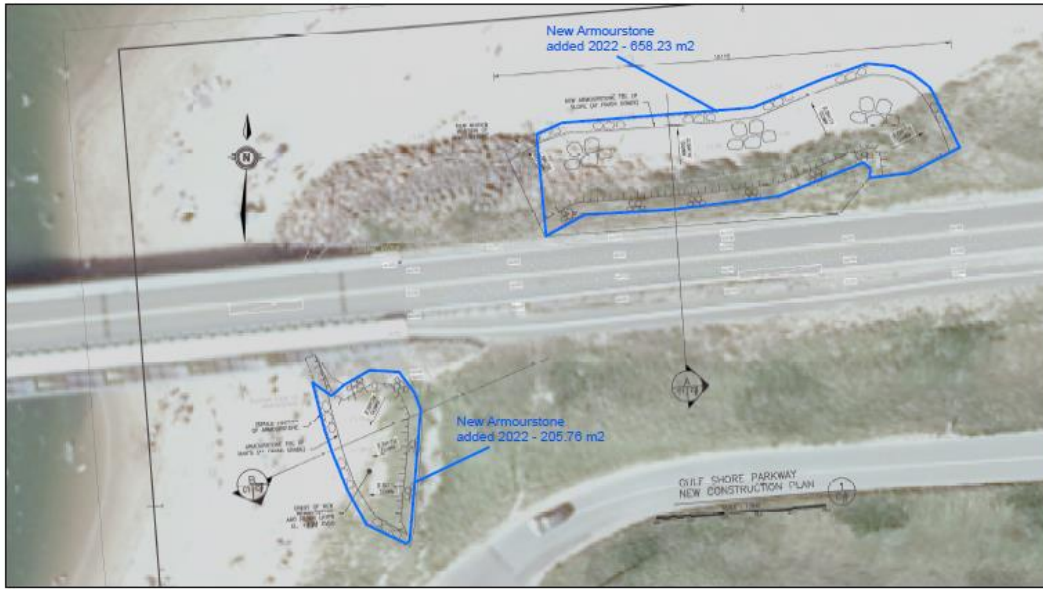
Proposed site for embankment protection, Covehead Bridge, PEINP.
